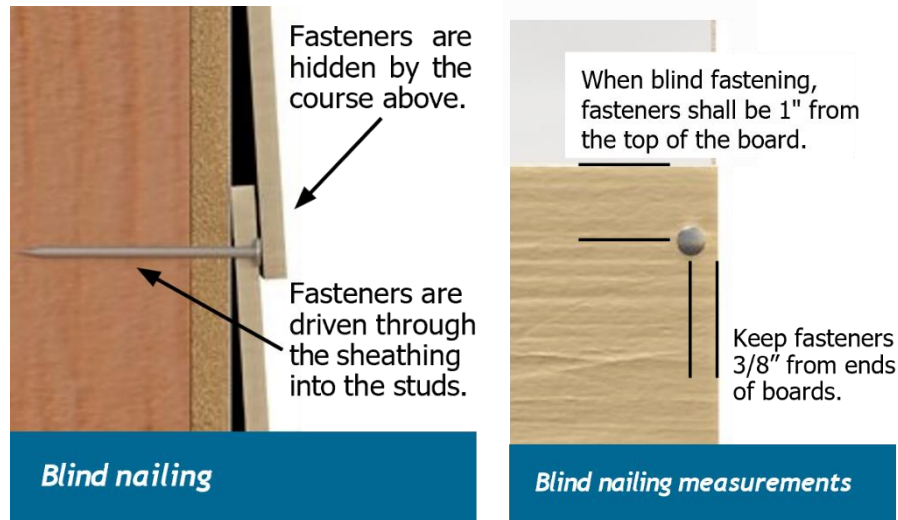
Allura® and TerraPlank™ Lap Siding Blind Nail Fastening Details
